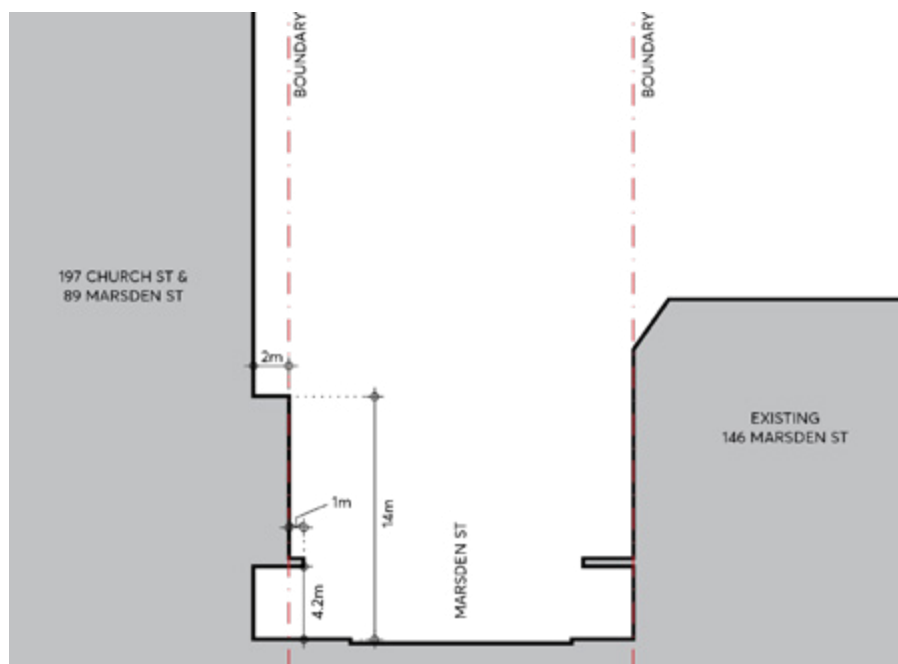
Marsden Street Frontage – Setbacks to Podium and Tower
